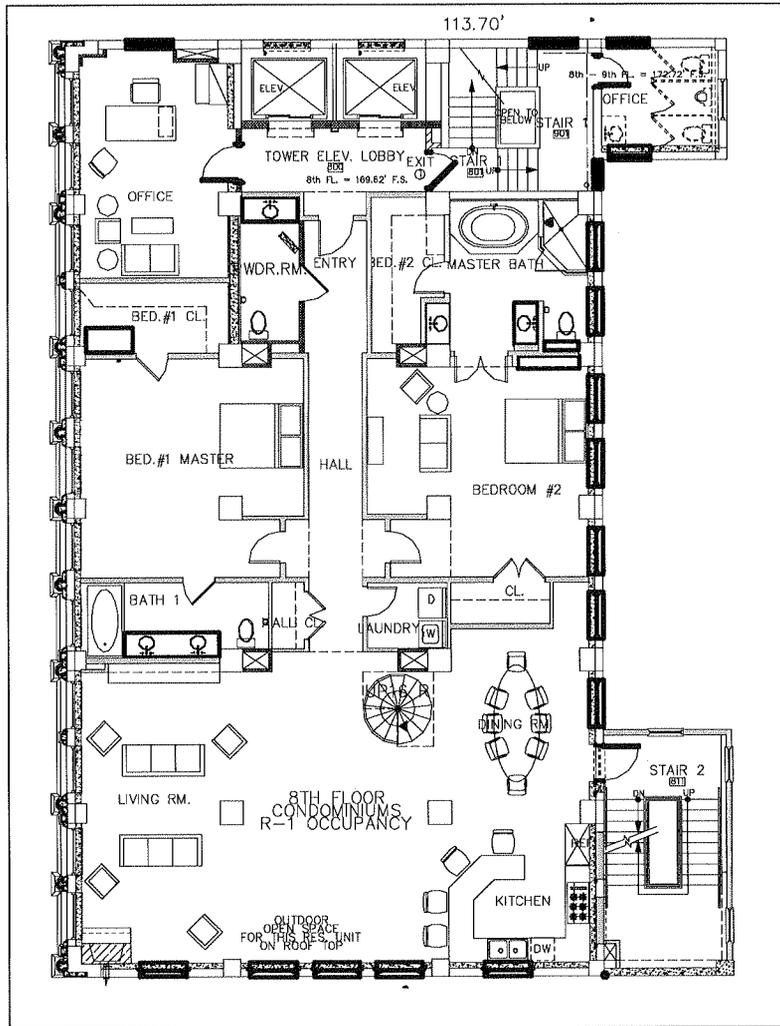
Eighth Floor Plan Showing Proposed Residential Facility and Stair to Outdoor Living Space Above
